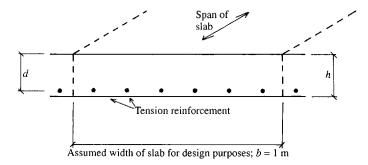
Typical cross-section through a one-way spanning solid slab
